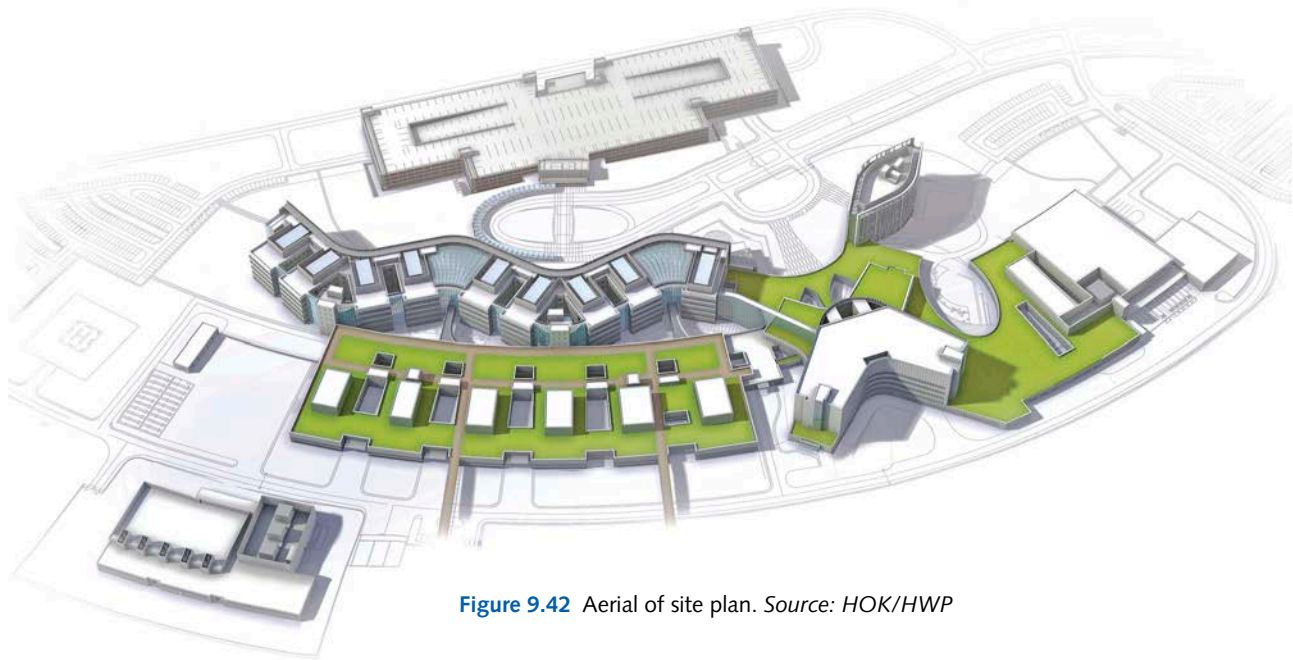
Aerial of site plan. *Source: HOK/HWP
